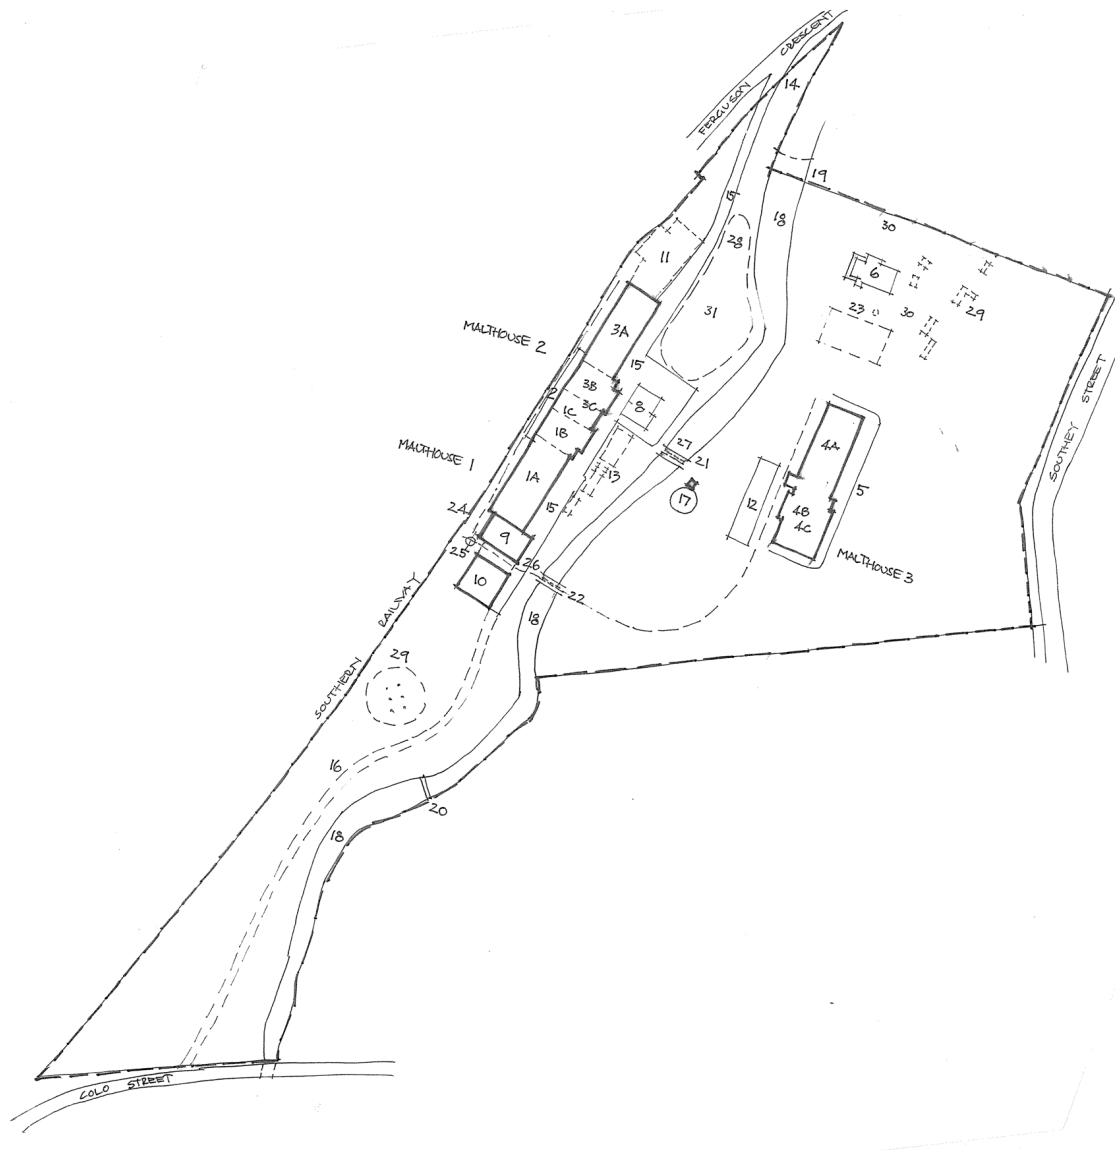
Site plan identifying key site elements. The built elements that comprise the two applications are:
